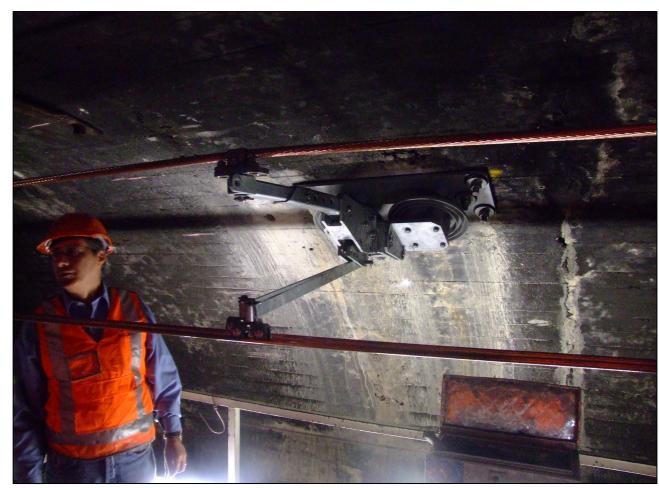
Lateral View of Mk-3 Tunnel Cantilever
